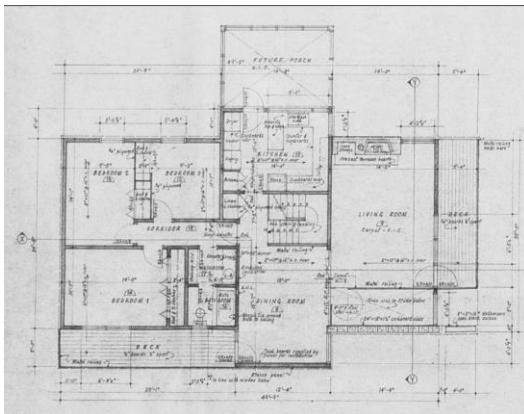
Living Space Floor Plans (BP48557 City of Ottawa 1961)
